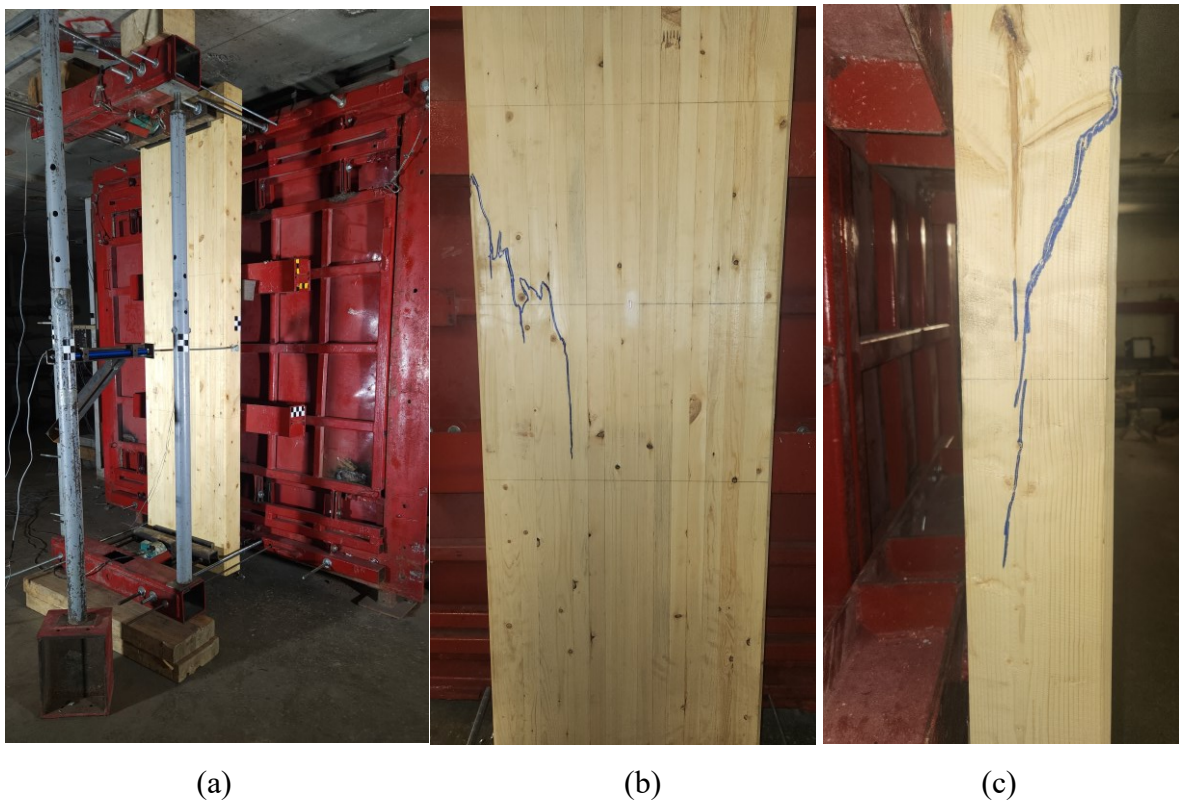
Dynamic Failure of GLT9 [130]: (a) Before test; (b) After test - front view; (c) After test - side view
